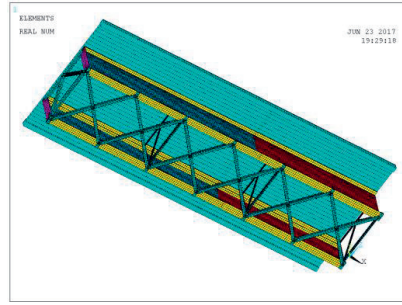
Bridge segment, from beneath, horizontal X-truss, RHS 200 x 200 x 10.
